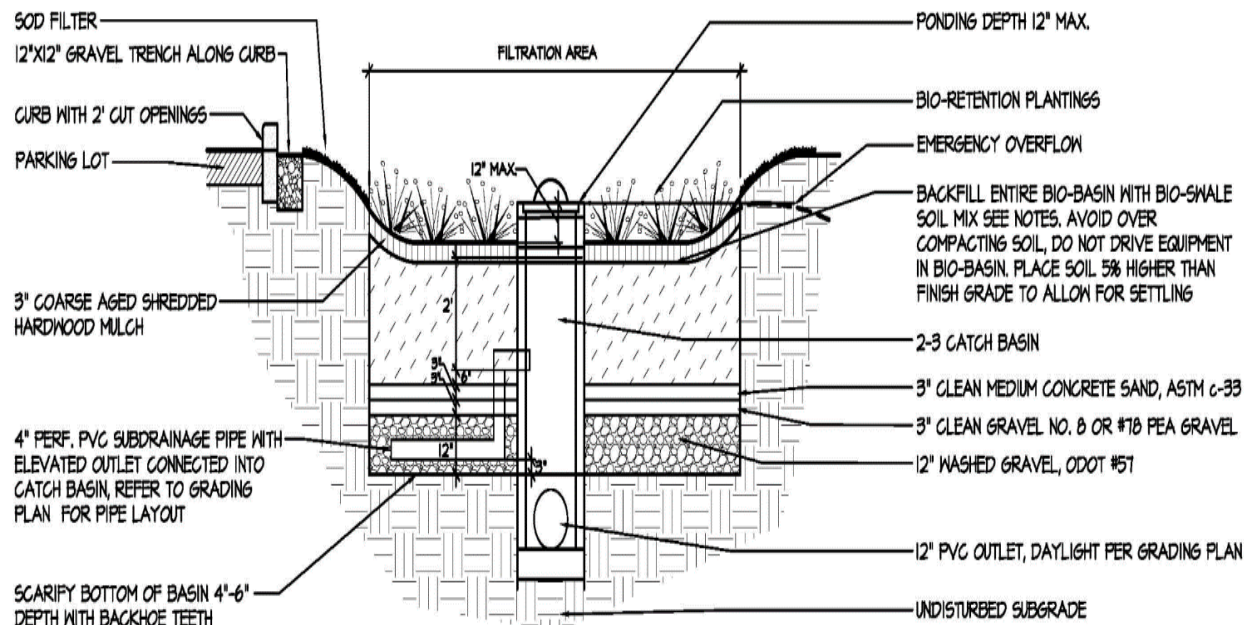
Internal Water Storage Created by an Upturned Elbow on Underdrain Pipe
